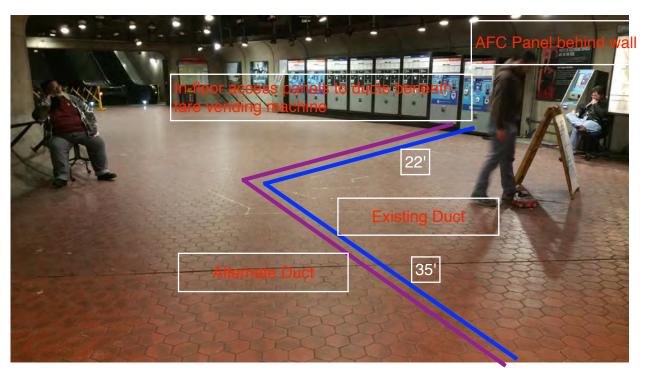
In floor access panels for existing and alternate ducts (beneath fare vending machine)
